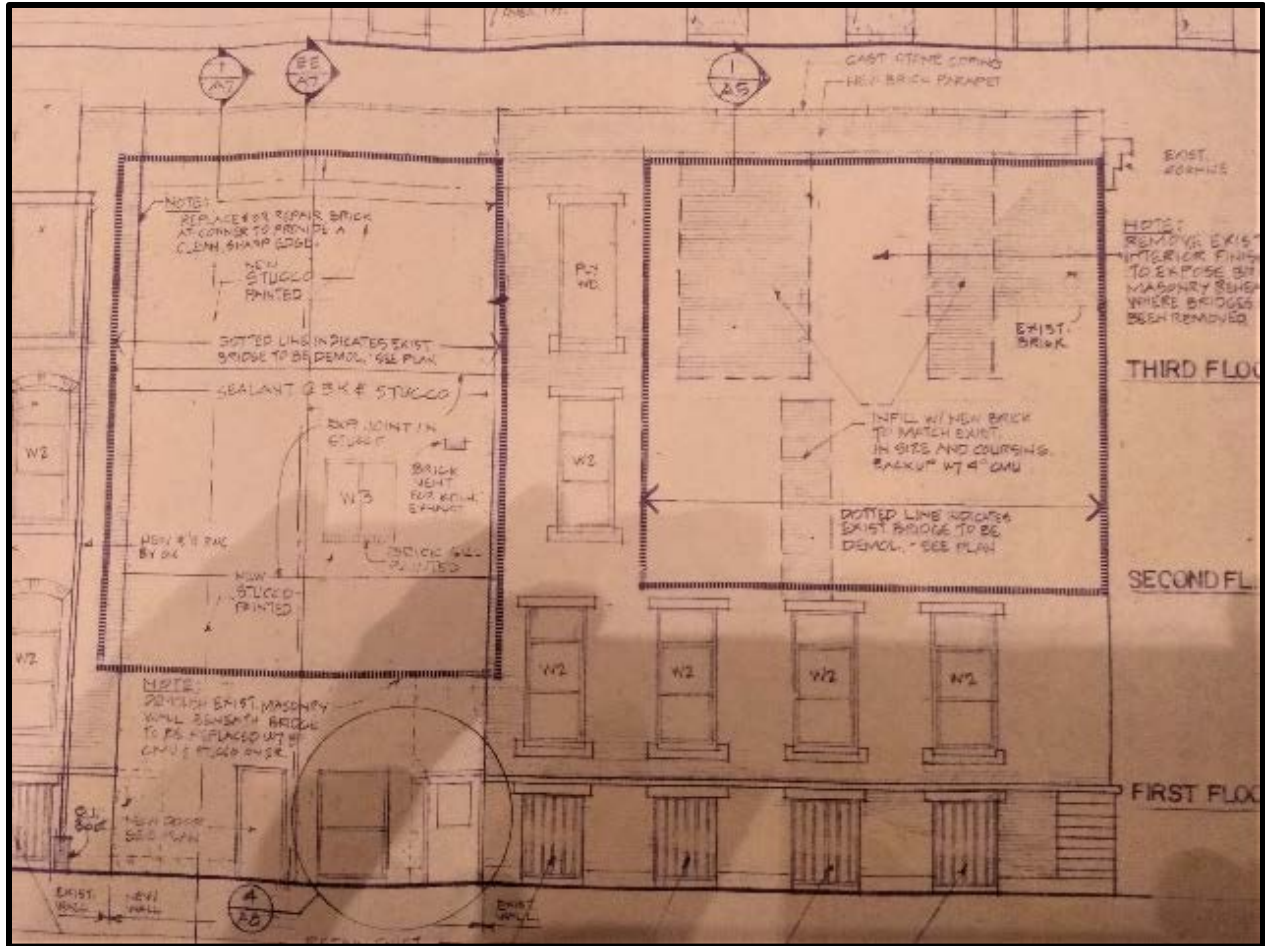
1978 architectural drawings, showing the removal of adjoining bridges along the north elevation to be removed, and areas of brick to be infilled. Courtesy of David S. Traub.
